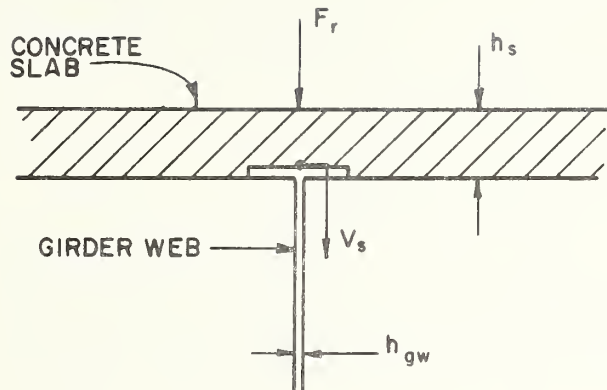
IDEALIZED MODEL OF AN ELEVATED STRUCTURE WITH A CONCRETE DECK ON STEEL-PLATE GIRDERS
